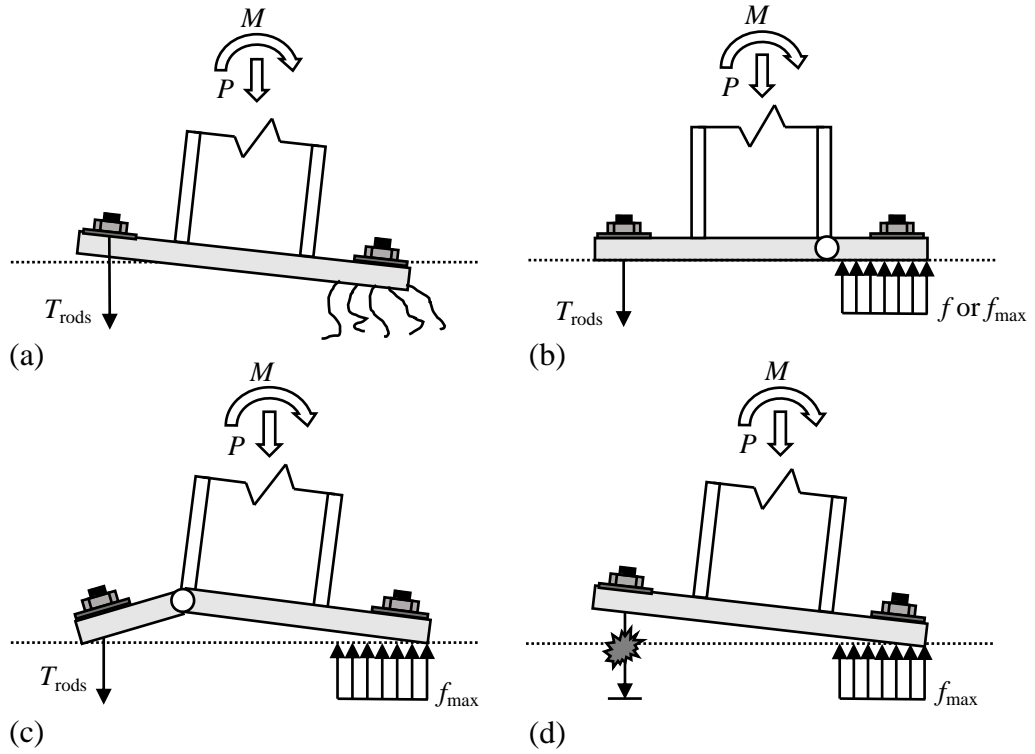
Schematic illustration of possible failure modes of ECBP connections subjected to flexure and axial forces: (a) BF – bearing failure of the grout/concrete foundation; (b) PC – plate yielding failure on the compression side; (c) PT – plate yielding failure on the tension side; and (d) AT – anchor rod tensile failure.
